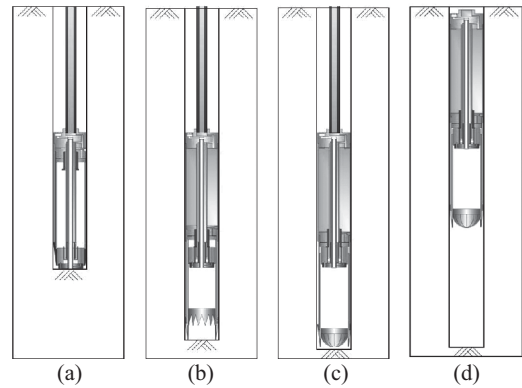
Schematic drawings of Gel-Push sampling technique. (a) Fixed rod and sampler, (b) Push sampler into soil, (c) Close catcher, and (d) Move out Gel-Push sampler.
